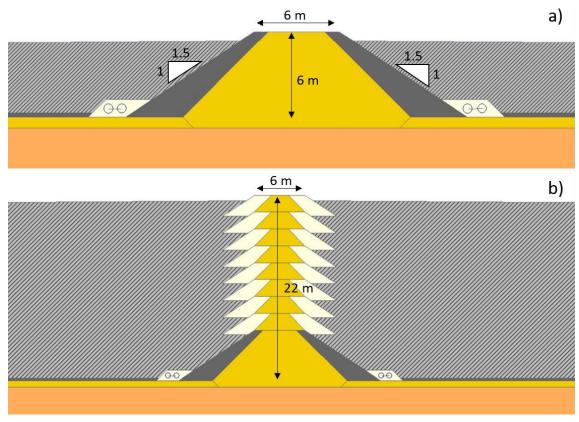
Common Wall Cross-Section. a) Stage 1. b) Stage 9
